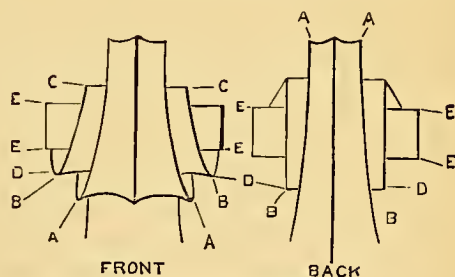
FRONT AND BACK OF PROPERLY CUT VOLUTE.
